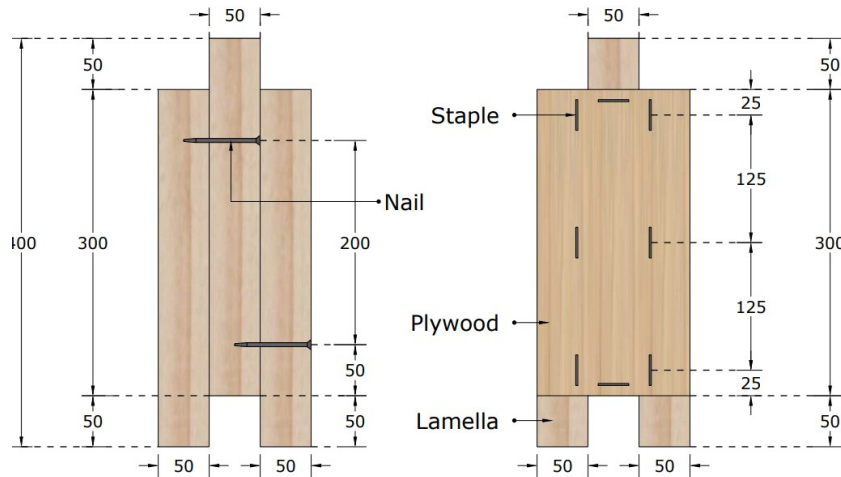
Test specimen configuration with dimensions in millimeters (mm).
